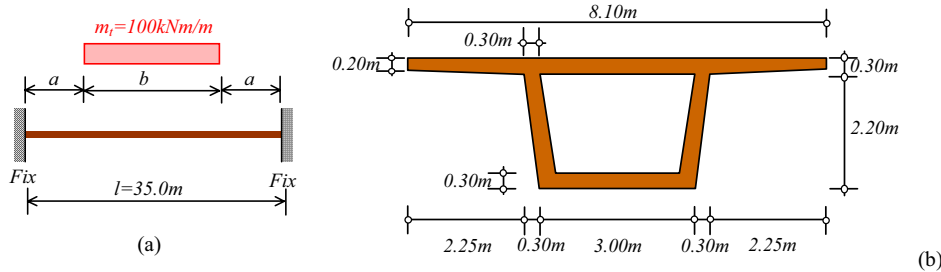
Clamped bar (a) of a concrete bridge box shaped cross section (b) of example 2.
